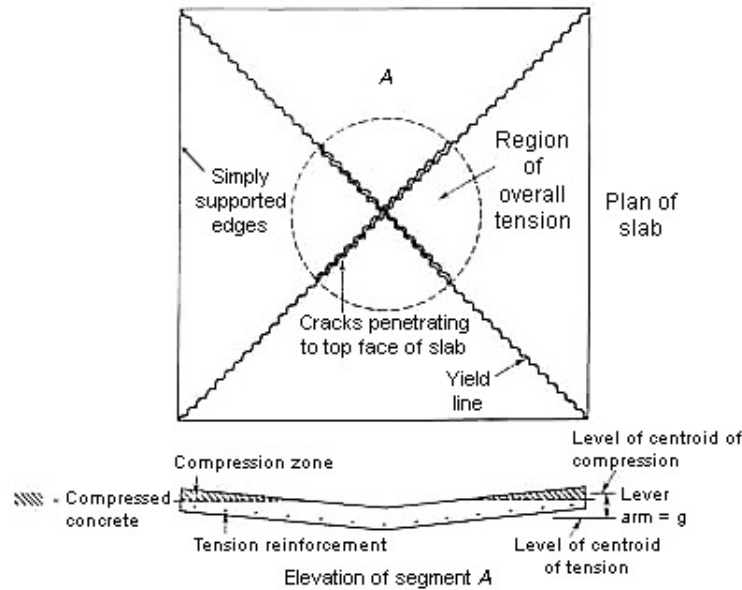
Tensile membrane action in an unrestrained, uniformly loaded slab [18]
